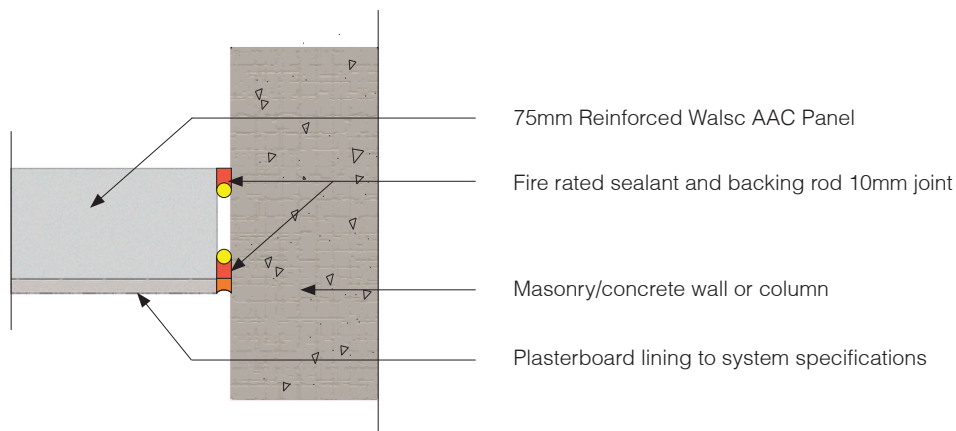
Service Shaft Wall Option 1 Column Control Joint Detail
